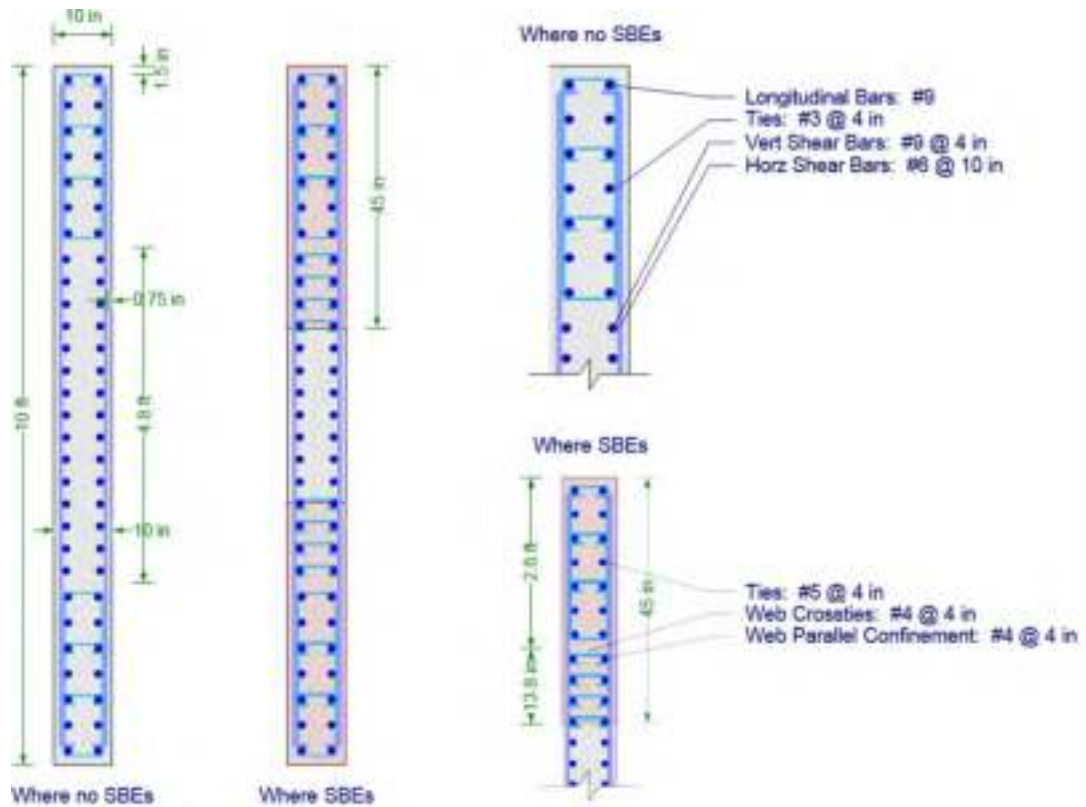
Sample Special RC Shear wall Reinforcement Details for 6-Story Buildings (B2-6S-M-S); Wall Section for Floors 1-3
